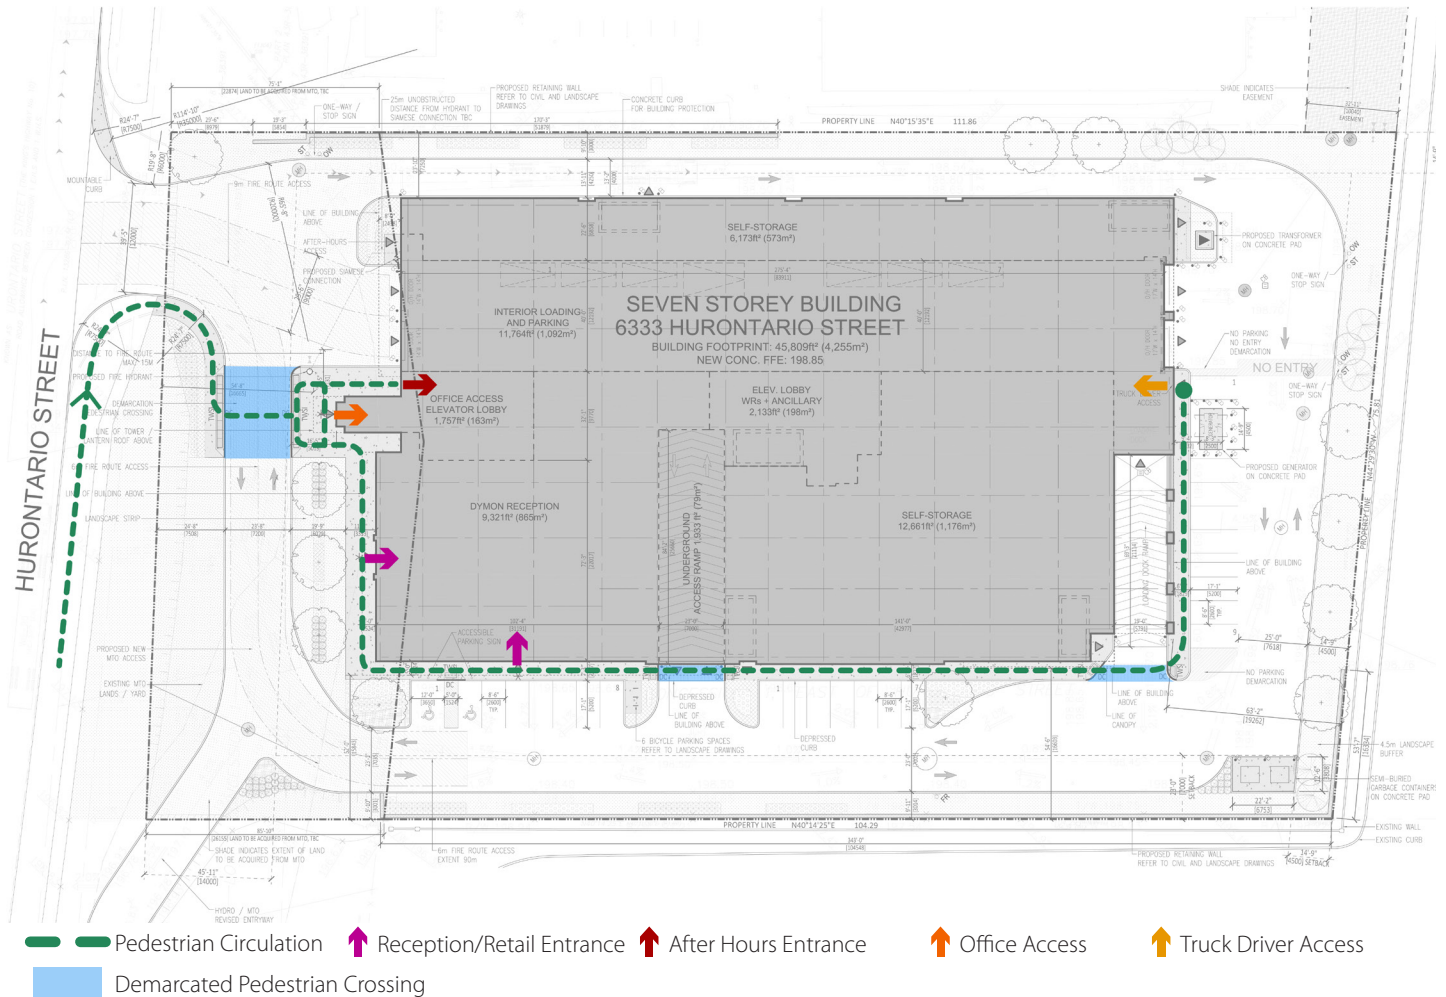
Pedestrian circulation and location of main and secondary building entrances. Site plan base by B+H Architects.
